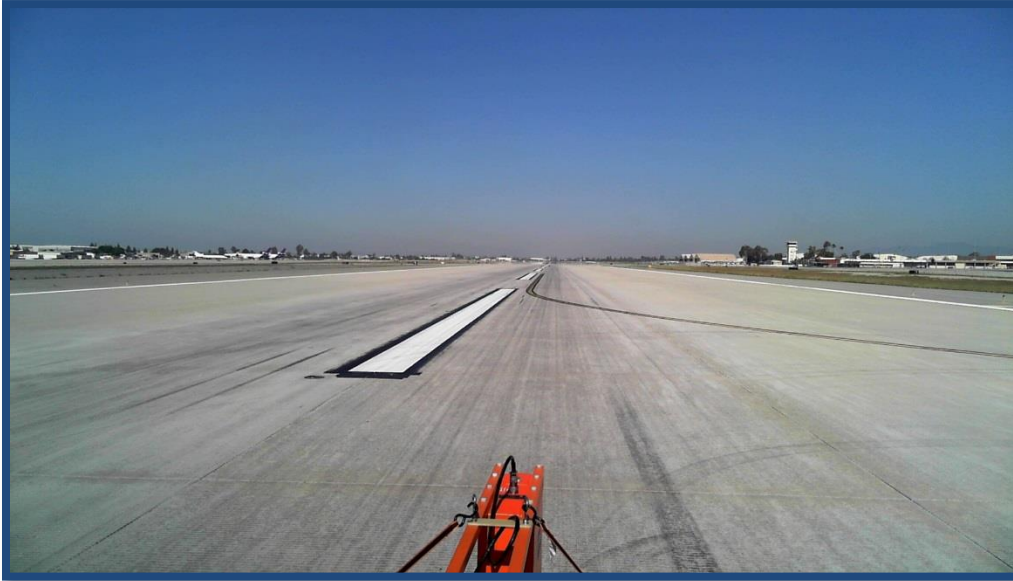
Runway 8L-26R Representative Pavement Condition (Sta. 59+75)
